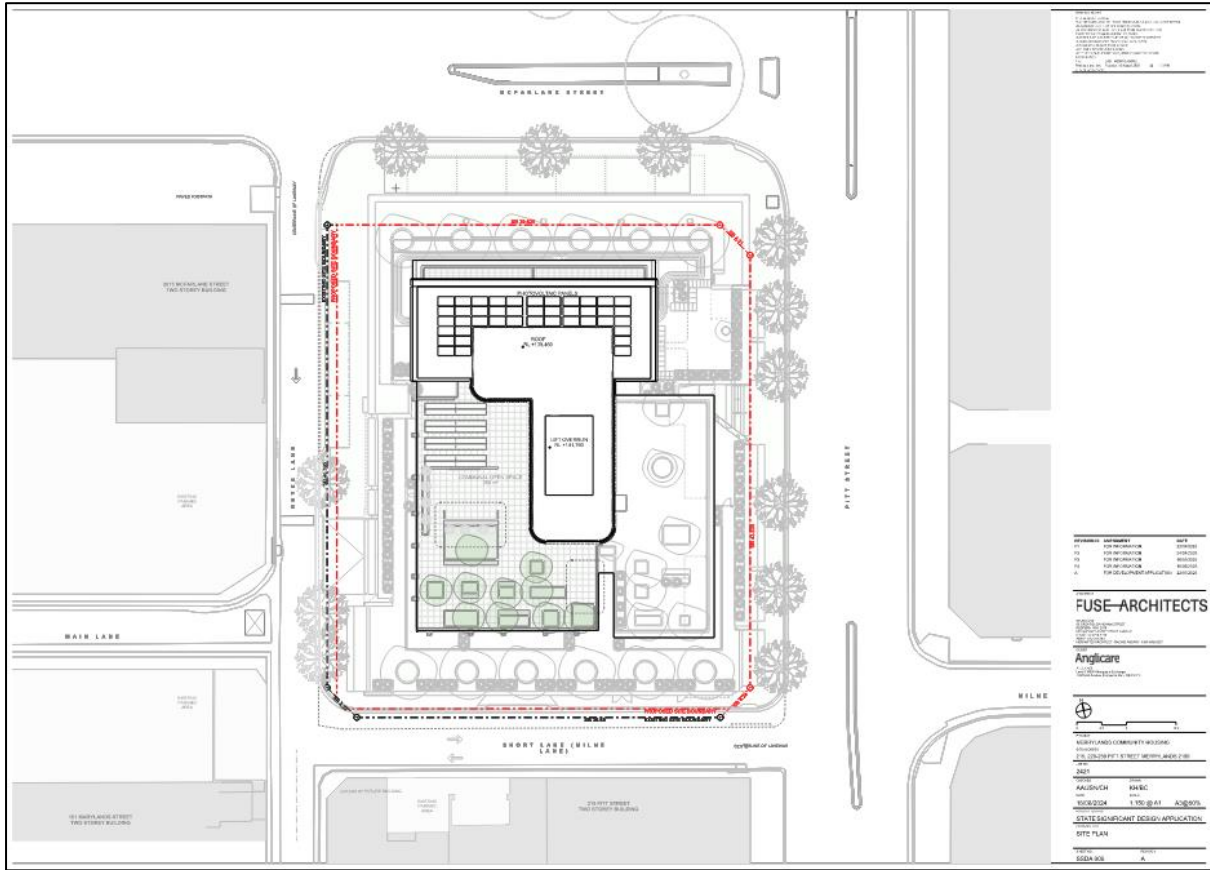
Proposed site plan (Source: Fuse Architects, Sheet SSSA 005, Rev. A, 22 July 2025)
